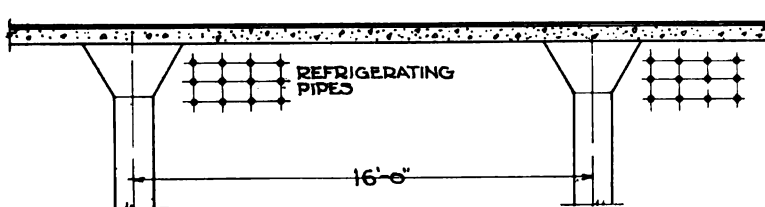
SECTION OF FLOOR WITH CANTILEVER FLAT SLAB CONSTRUCTION.
